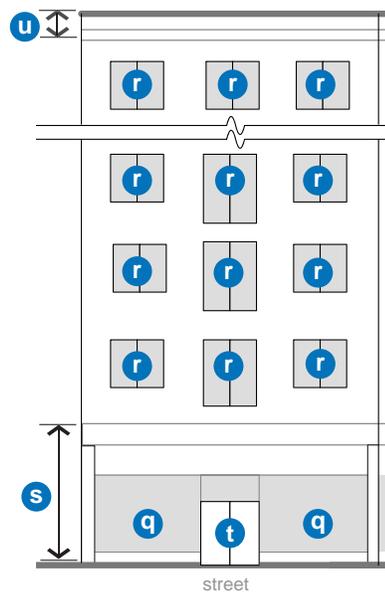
(3) Storefront Building: Street Facade Requirements
